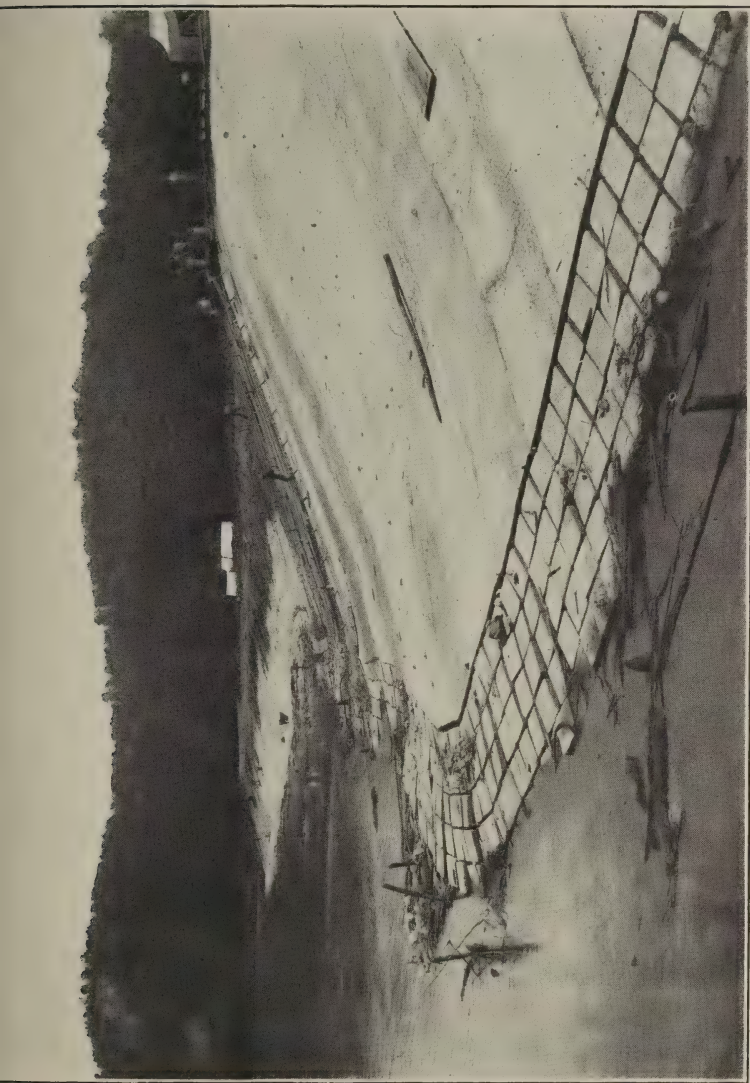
Concrete revetment at Gasconade, Mo. Looking downstream.
